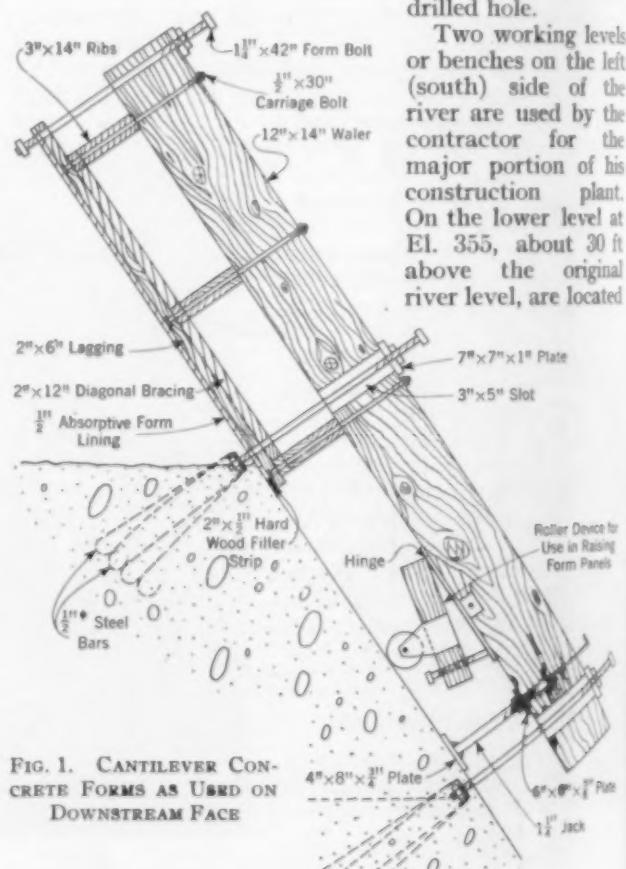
CANTILEVER CONCRETE FORMS AS USED ON DOWNSTREAM FACE
